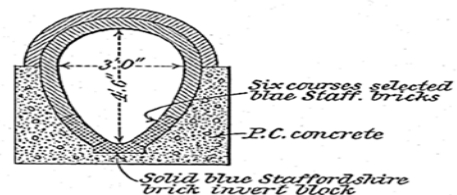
Section of Egg-shaped Sewer, showing use of Invert Block and Subsoil Drain.
